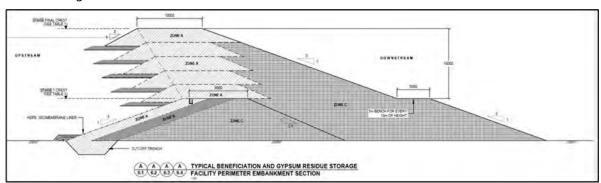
Typical Beneficiation and Gypsum Residue Storage Perimeter Embankment Section
